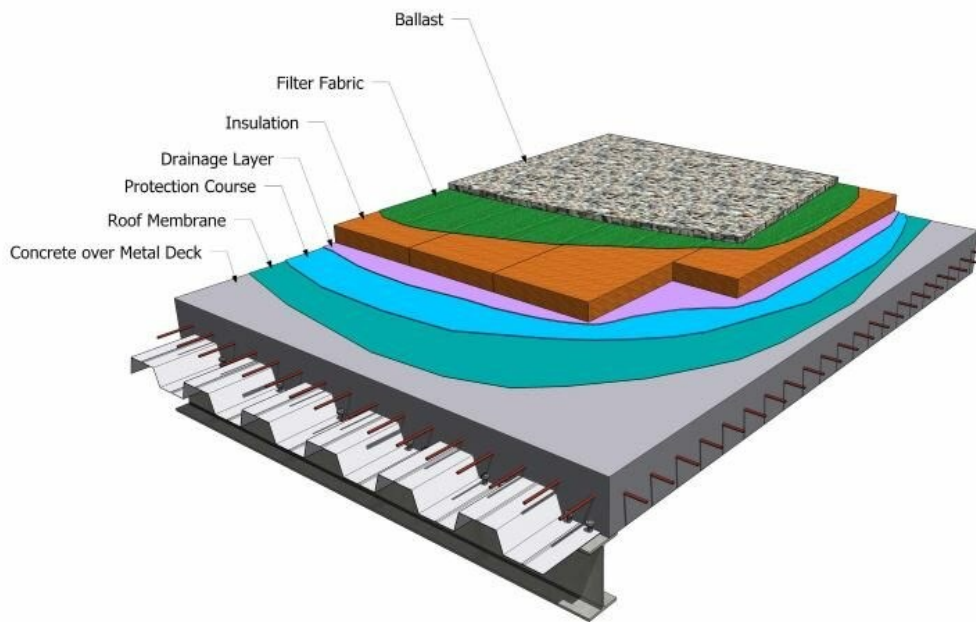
Blue Roof Cross-Section (“Design Considerations for Blue Roofs” 2017)
